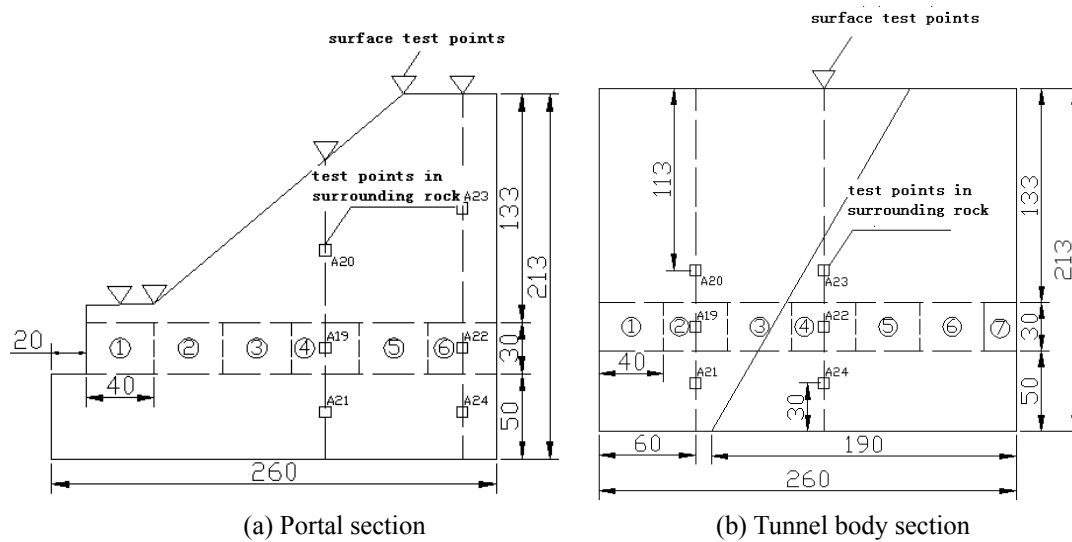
Front view of the arrangement of test points in tunnel and surrounding rock
